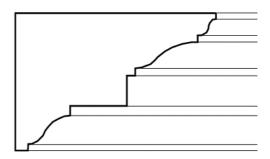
Timber box cornice with mitred ends; ground floor no. 31 Great James Street, Camden 1720s.
